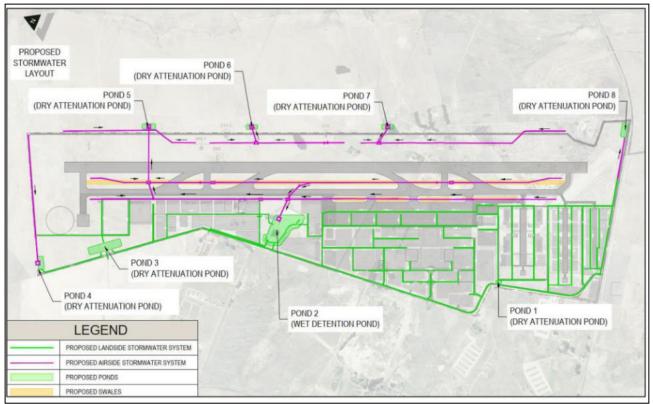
Proposed stormwater management layout (Zutari, Stormwater Management Plan, September 2024)
